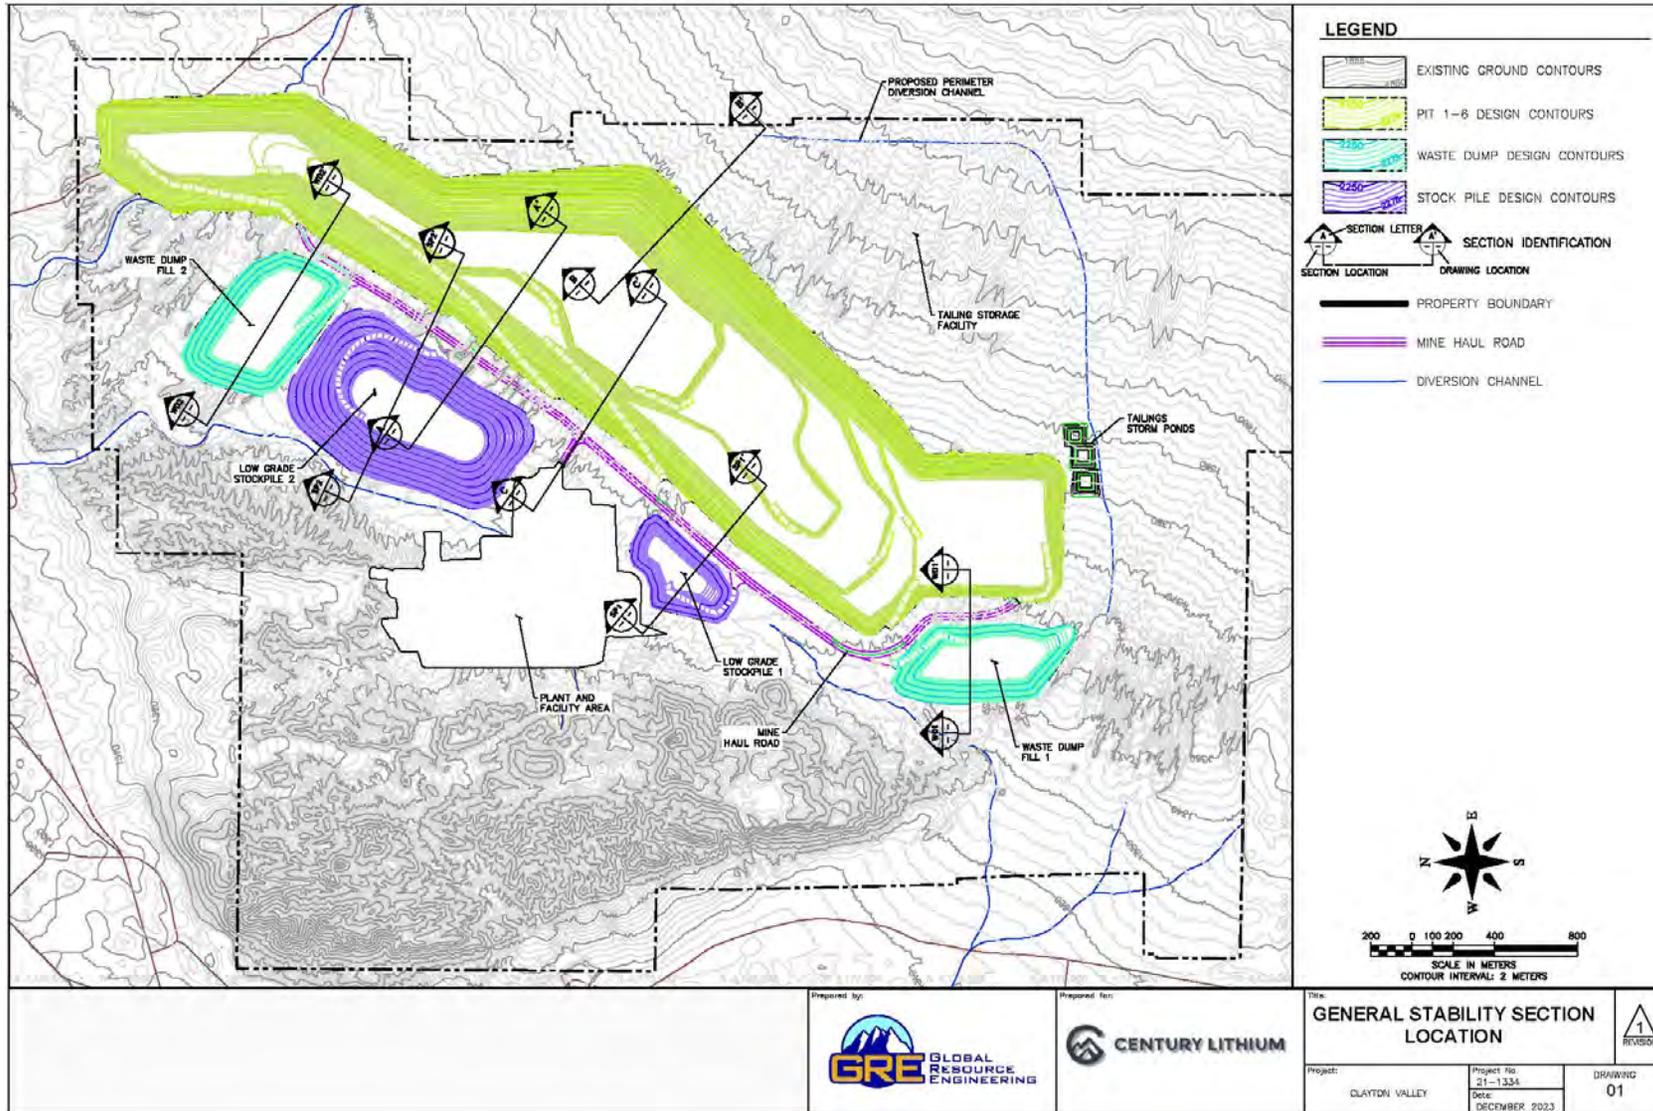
General Stability Section Locations (Source: GRE, 2023)
